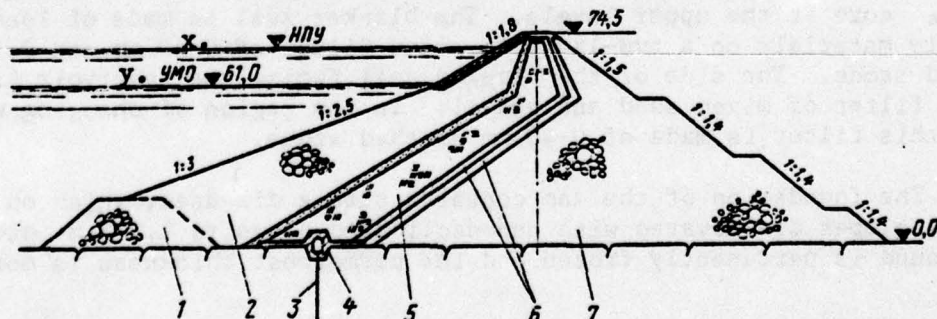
Rock Fill Dam of the Vilyuy Hydroelectric Power Station. 1 - Toe; 2 - Fill; 3 - Grout screen; 4 - Grouting tunnel; 5 - Blanket seal; 6 - Inverted filters; 7 - Supporting prism. Key: x - NHL; y - LWL.
